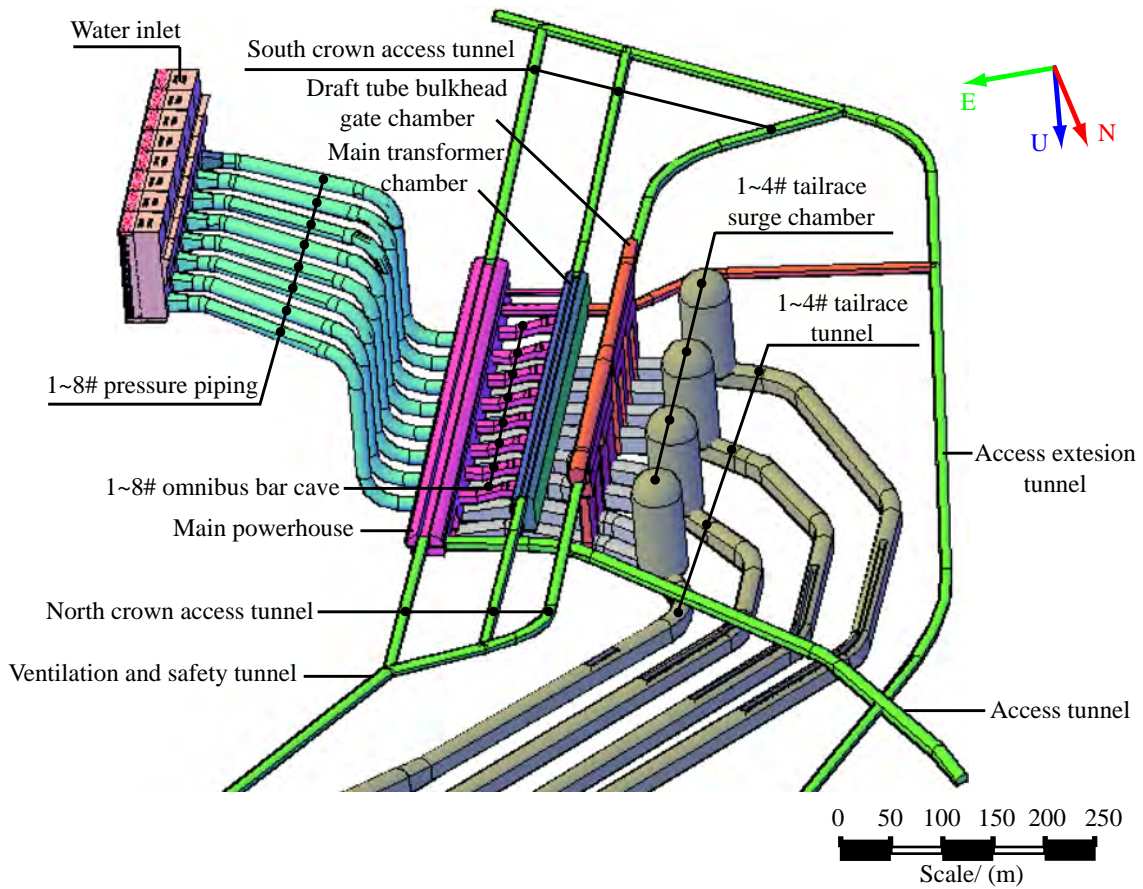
Layout of the left-bank large-scale underground powerhouse caverns.
